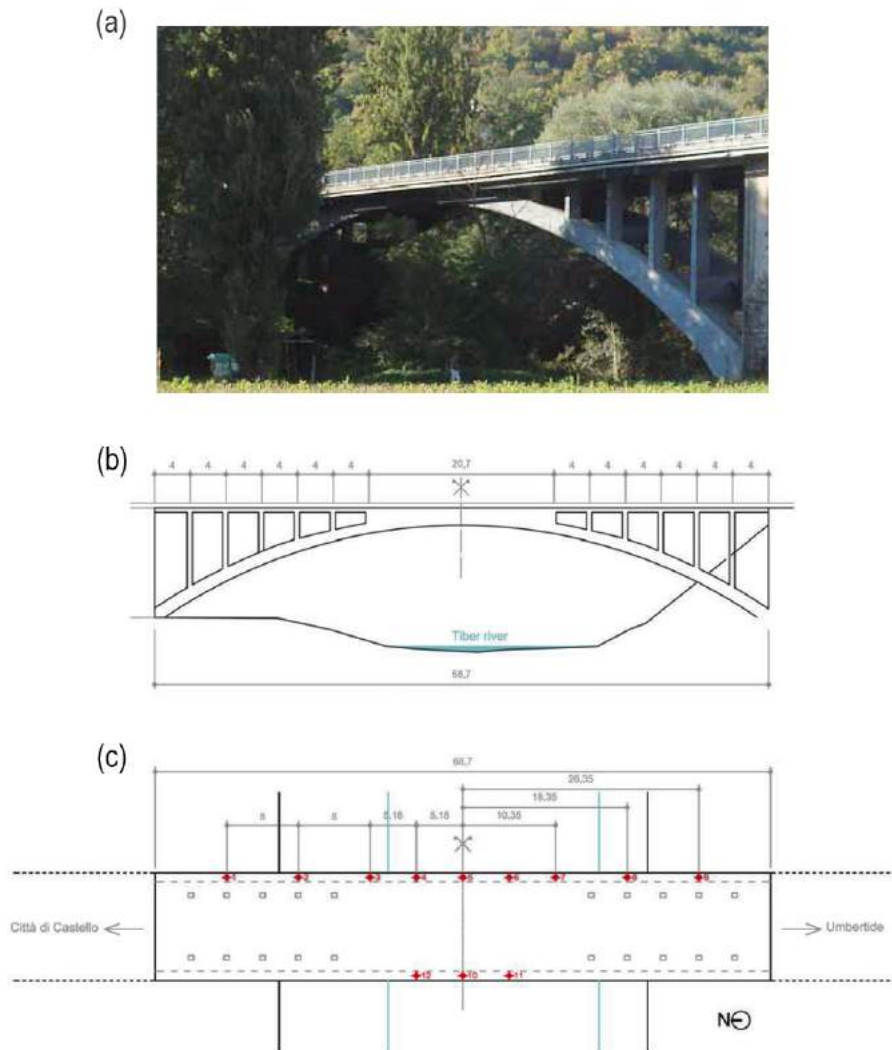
Montecastelli bridge over Tiber river: view (a), elevation (b), plan and sensors layout (c).
